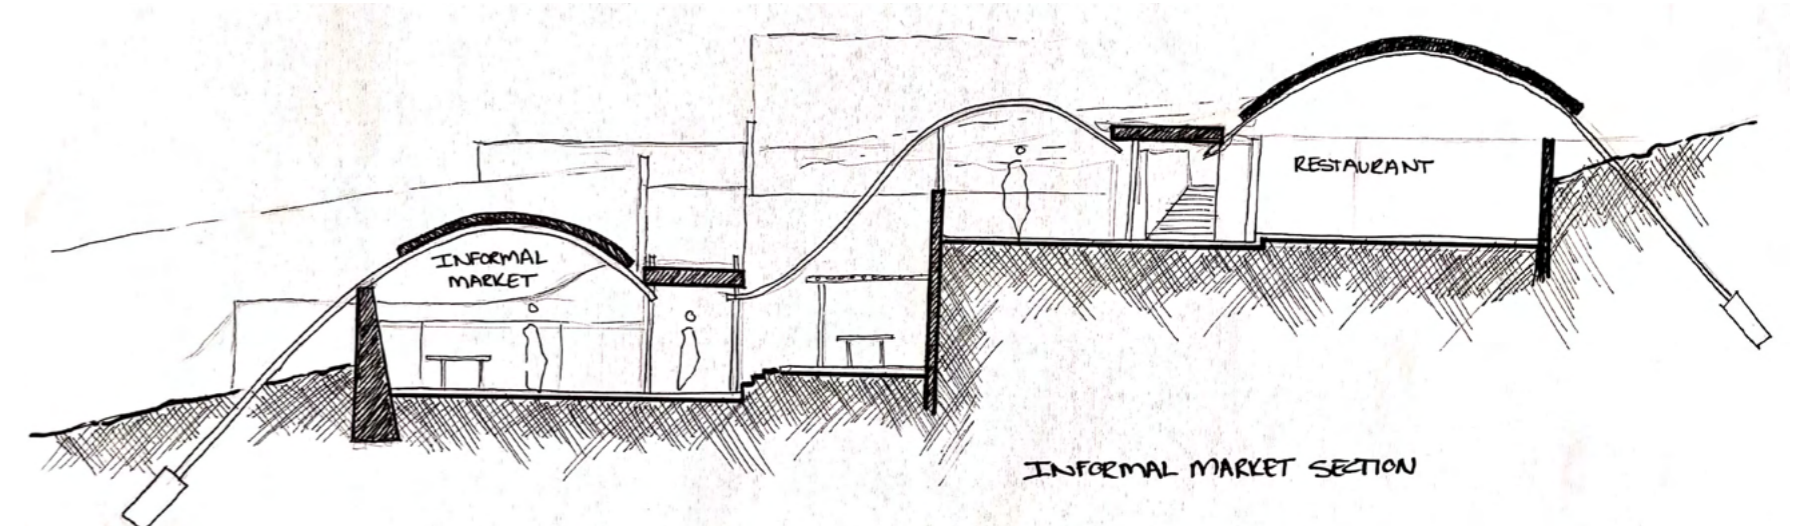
Design Approach 3 Sectional Roof Development (Author, 2021)
